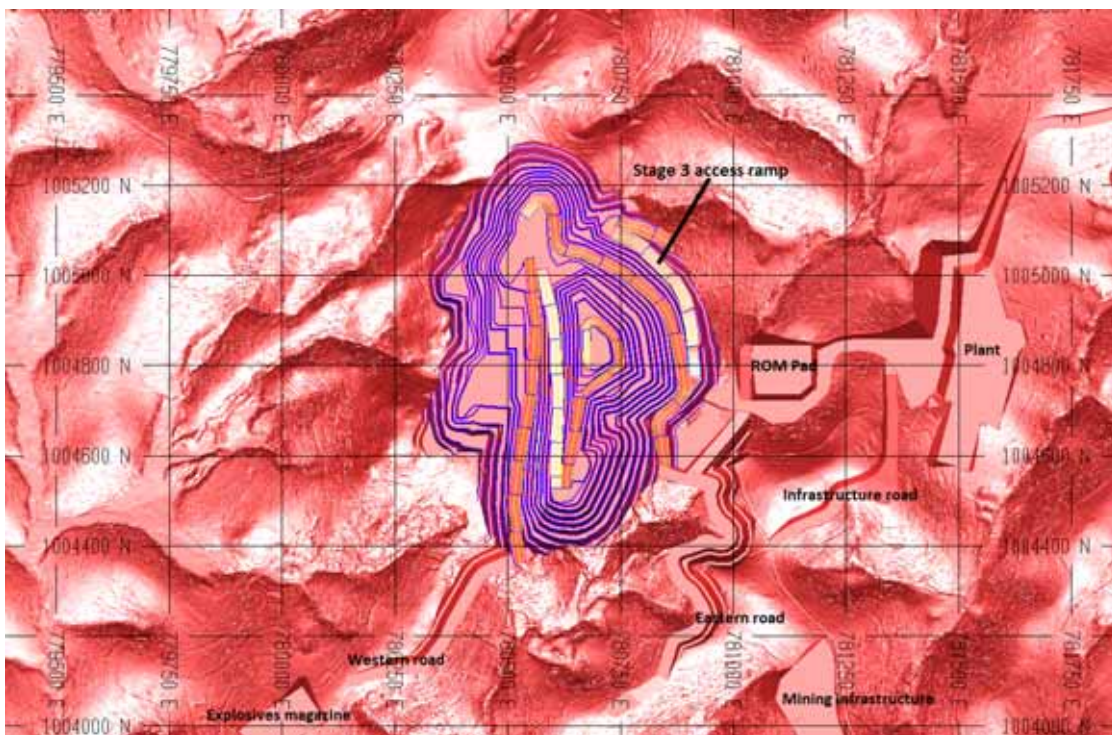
shows pit Stage 2. The Stage 3 access ramp maintains access to the top benches of Stage 3b.
